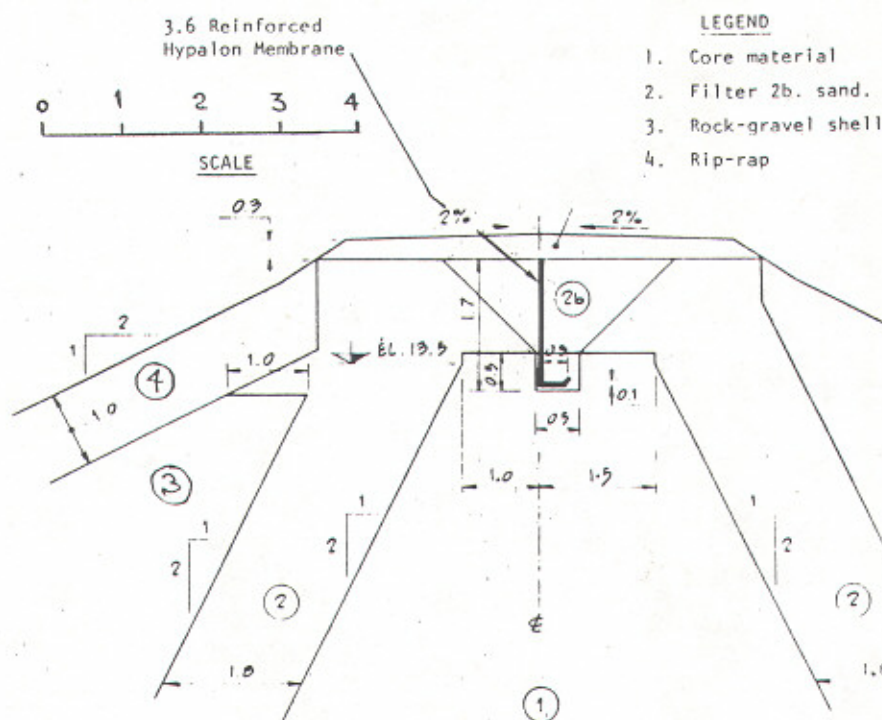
CREST DETAIL, LACHUTE DAM
